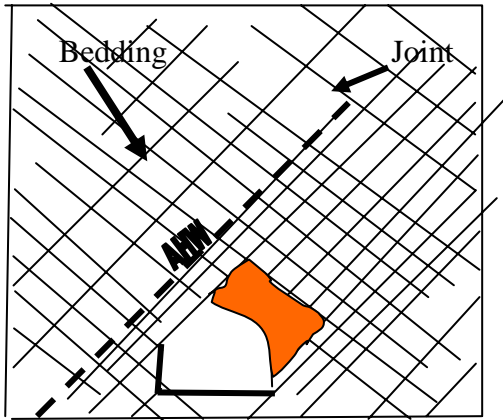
Typical failure in H/W drive mined In jointed kaolinized Ore Shale
